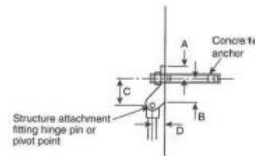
(c) Dimensions of Concrete Anchor for Orientations G, H, and I.
